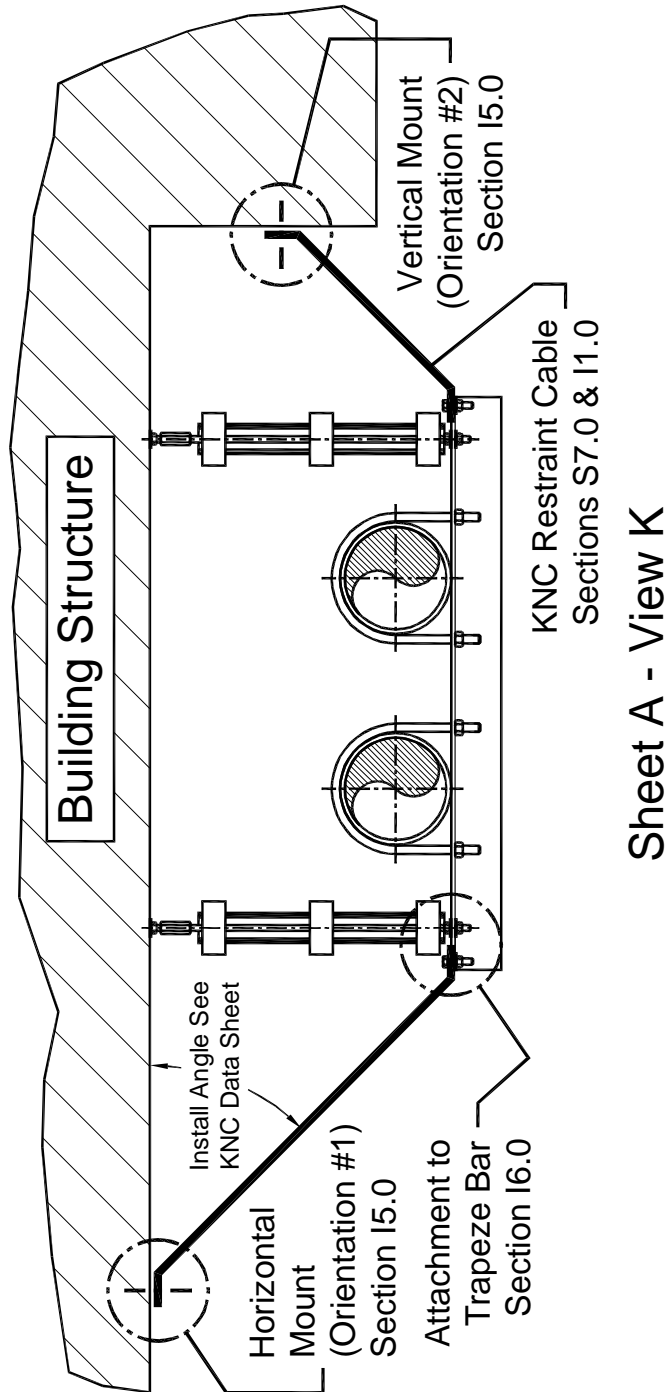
; Transverse (T) Cable Restraint Schematic Arrangement for Trapeze Supported Pipe – Cable Restraints Attached to Both Ends, or Hanger Rods, of the Trapeze Bar and Directed Outside the Trapeze
